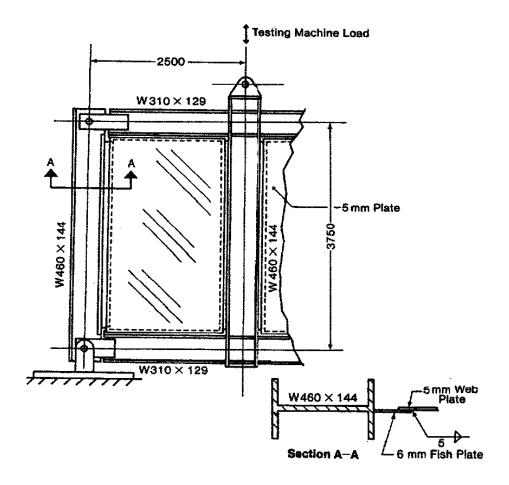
Schematic of Test Specimen (Timler and Kulak 1983)
